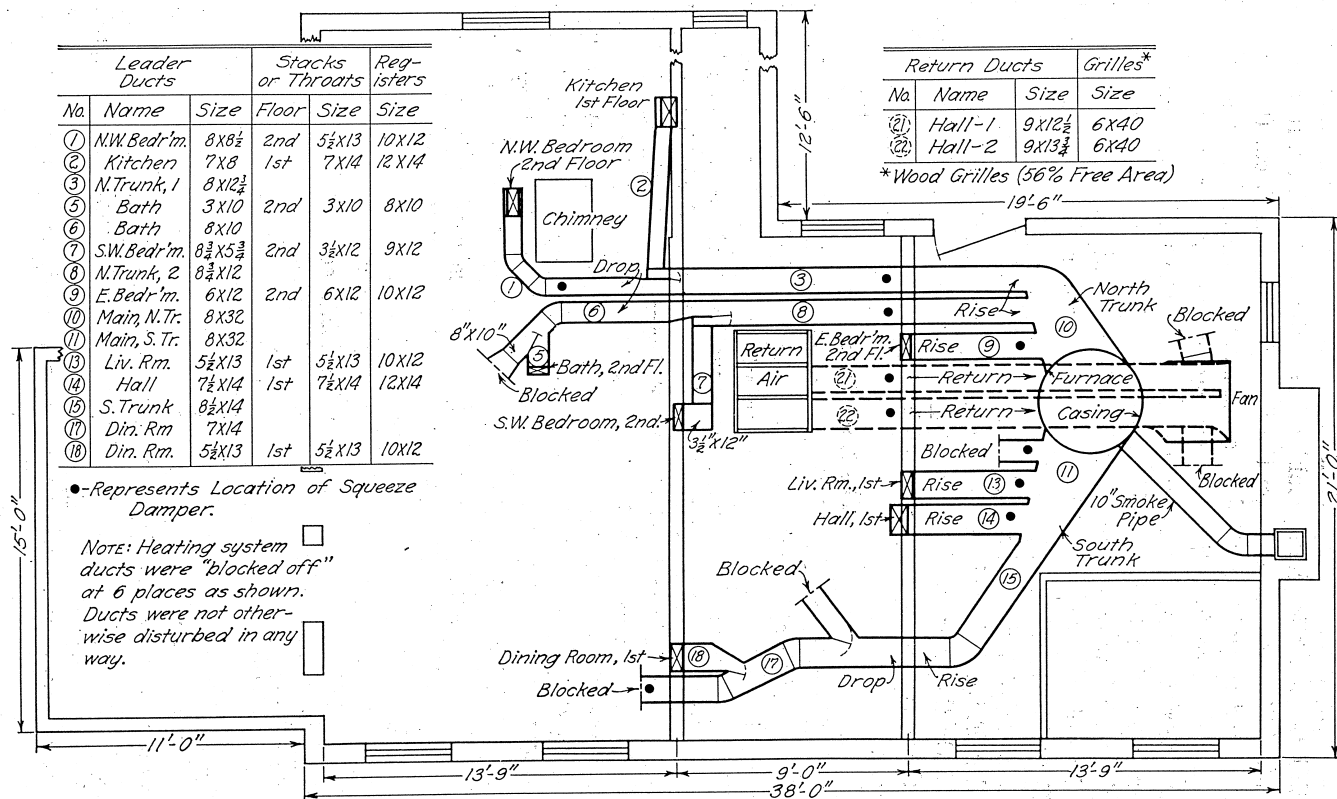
BASEMENT PLAN SHOWING DUCT LAYOUT FOR FORCED-AIR SYSTEM IN USE FOR DISTRIBUTING COOL AIR
